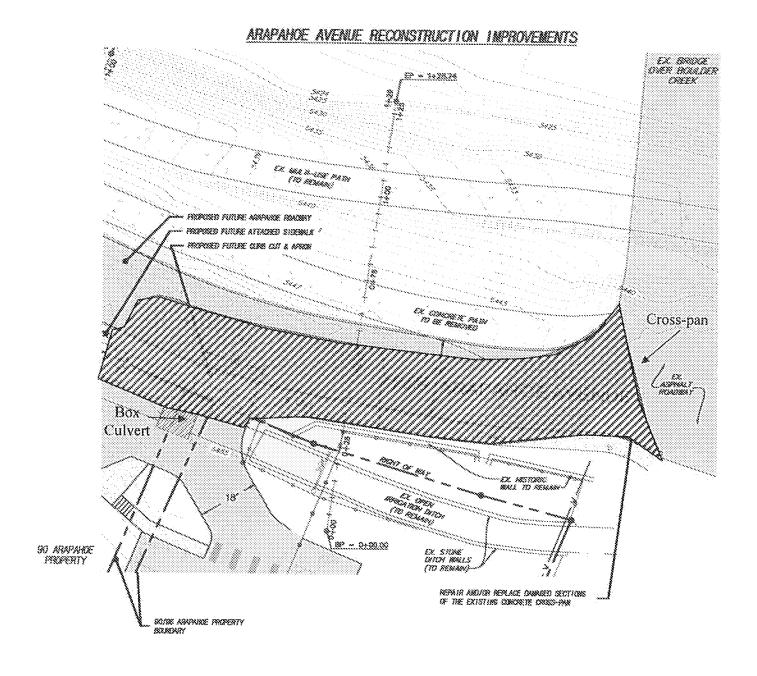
EXHIBIT J ARAPAHOE AVENUE RECONSTRUCTION IMPROVEMENTS
